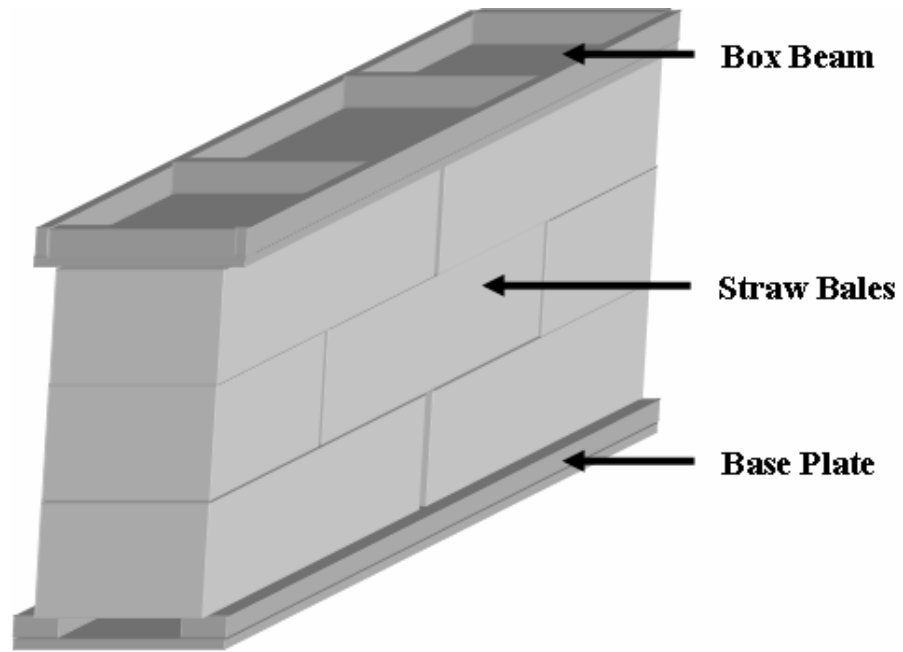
Simplified Typical Wall Details (Un-Plastered, Incomplete Box Beam)
